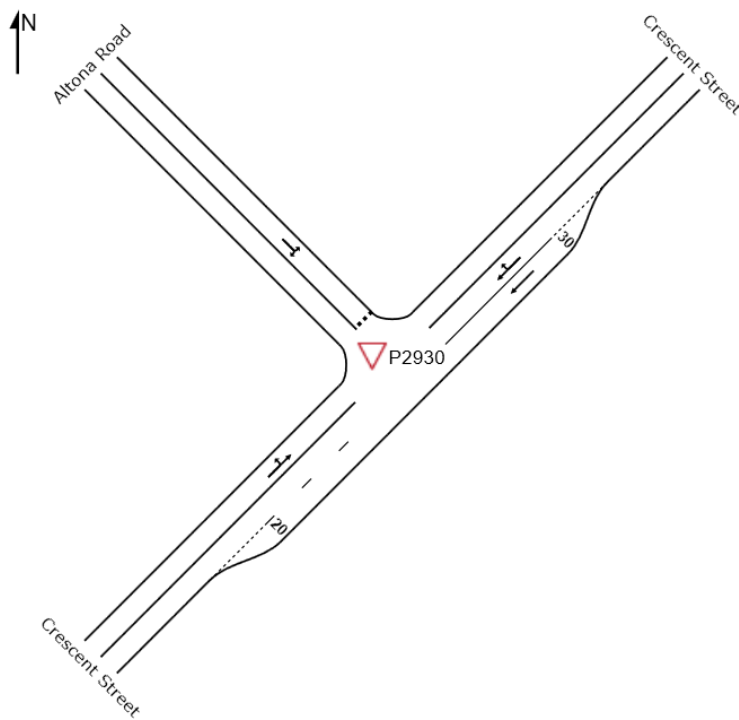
Crescent Street / Altona Road Intersection Layout
